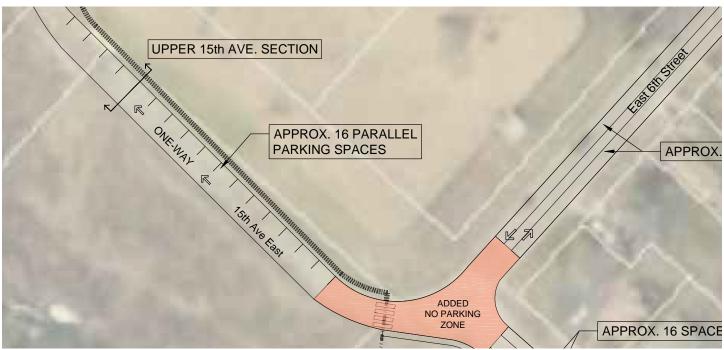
PHASE II PARKING PLAN; UPPER 15th AVE E
